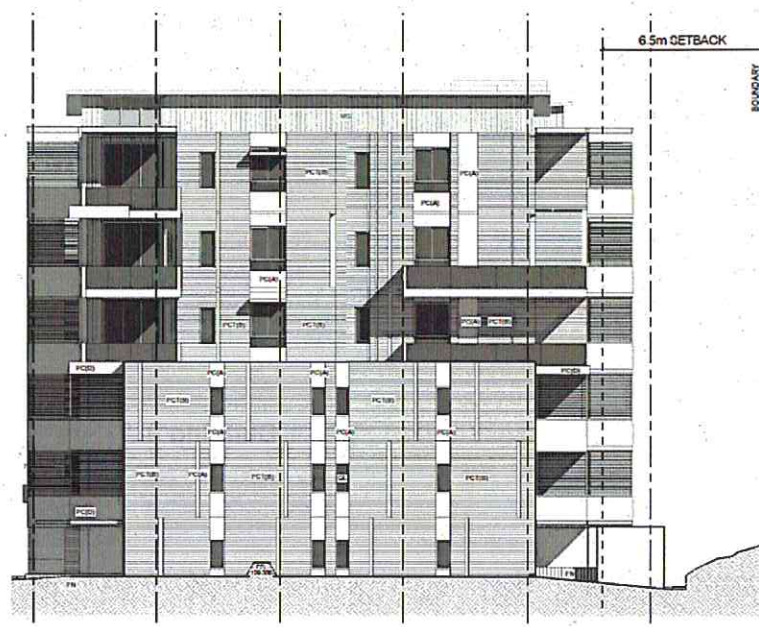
Building 9 setback to northern boundary (Source: Additional Information Report)
